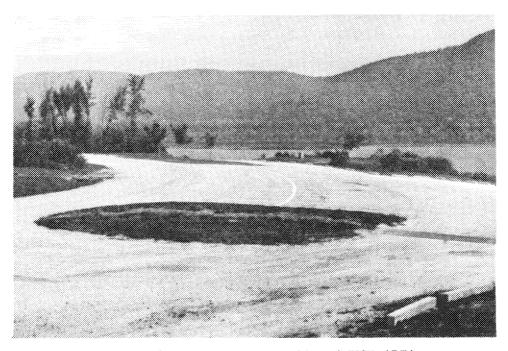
PARKING AND BOAT LAUNCH AREA
